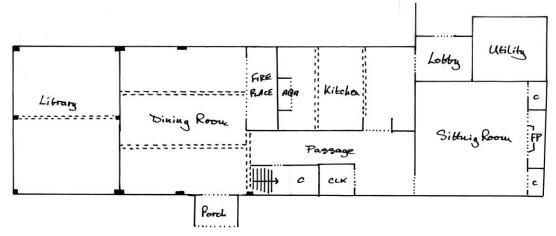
Ground-floor plan of St Mary's House, May 2011.
